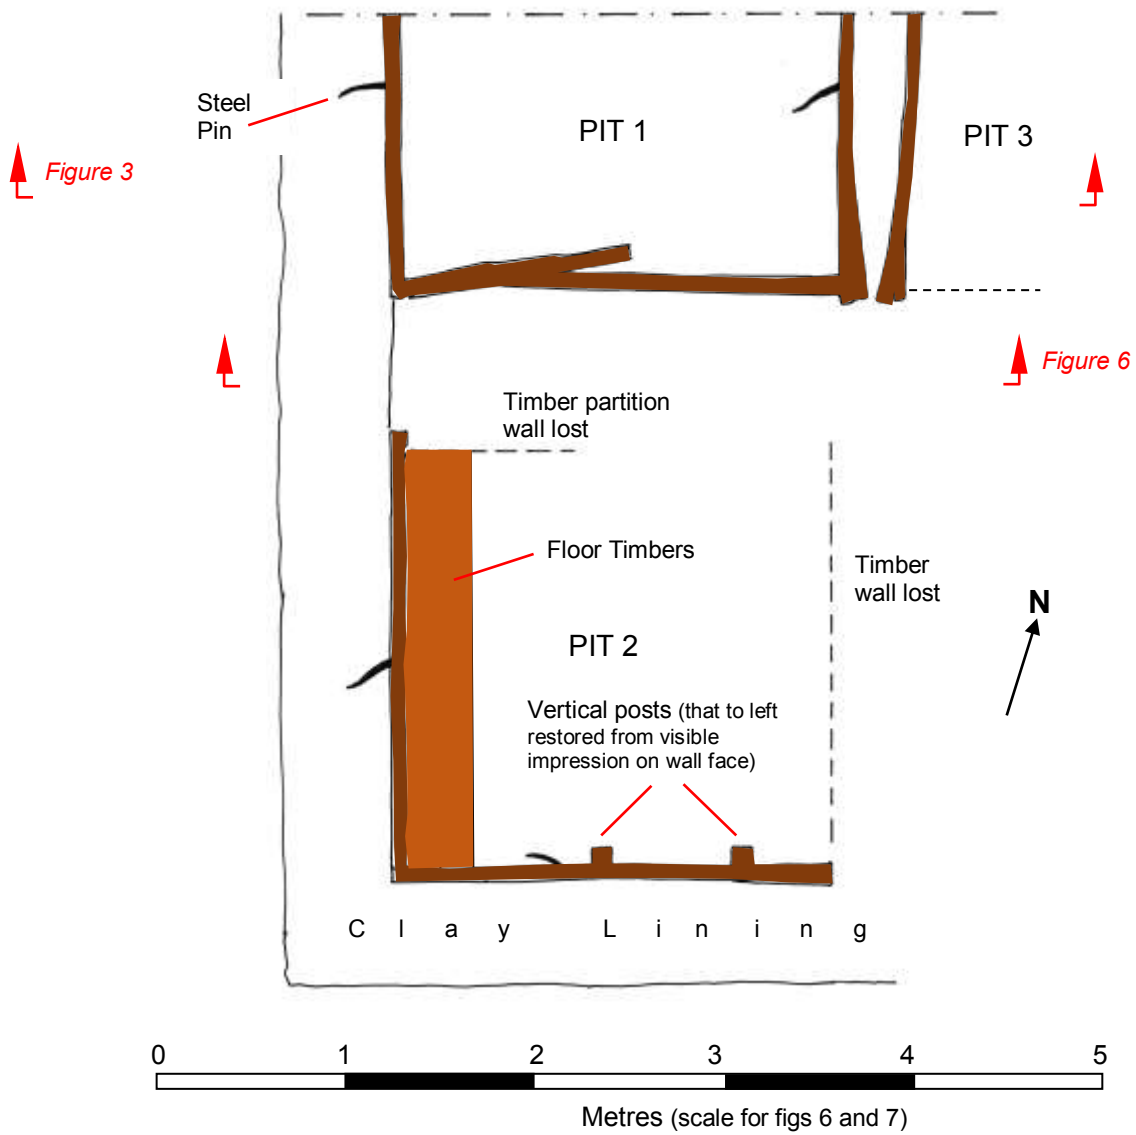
Plan of Tanning Pits. Red arrows indicate locations of figures 3 and 6. Steel pins were set vertically in drilled holes through most of the lining walls as shown.
